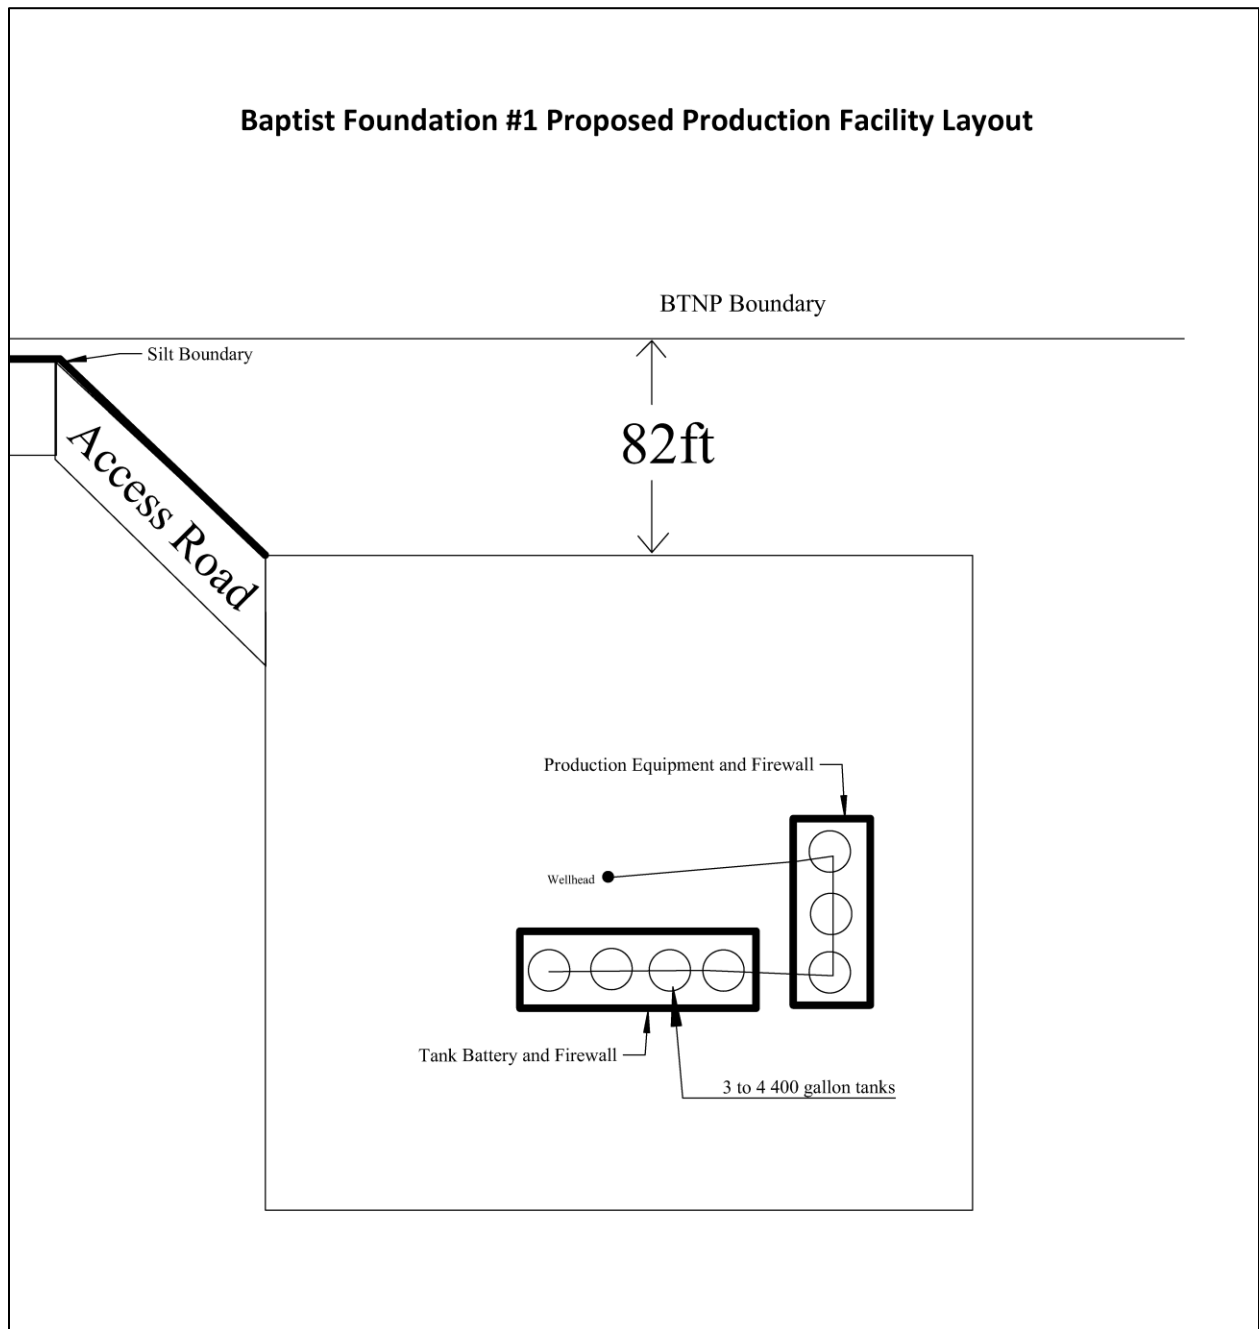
Proposed Baptist #1 Well Production Facility Layout
